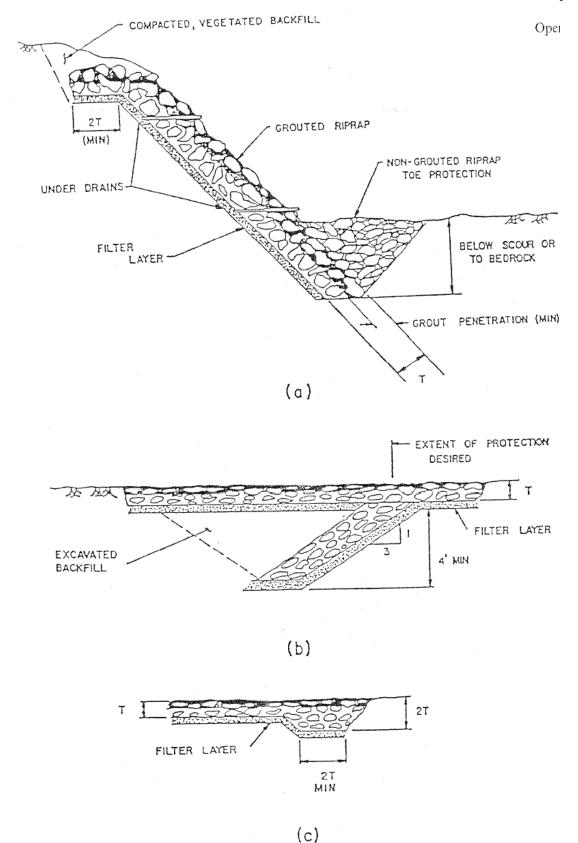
Grouted Riprap Sections: (a) Section; (b) Upstream Flank; and (c) Downstream Flank
